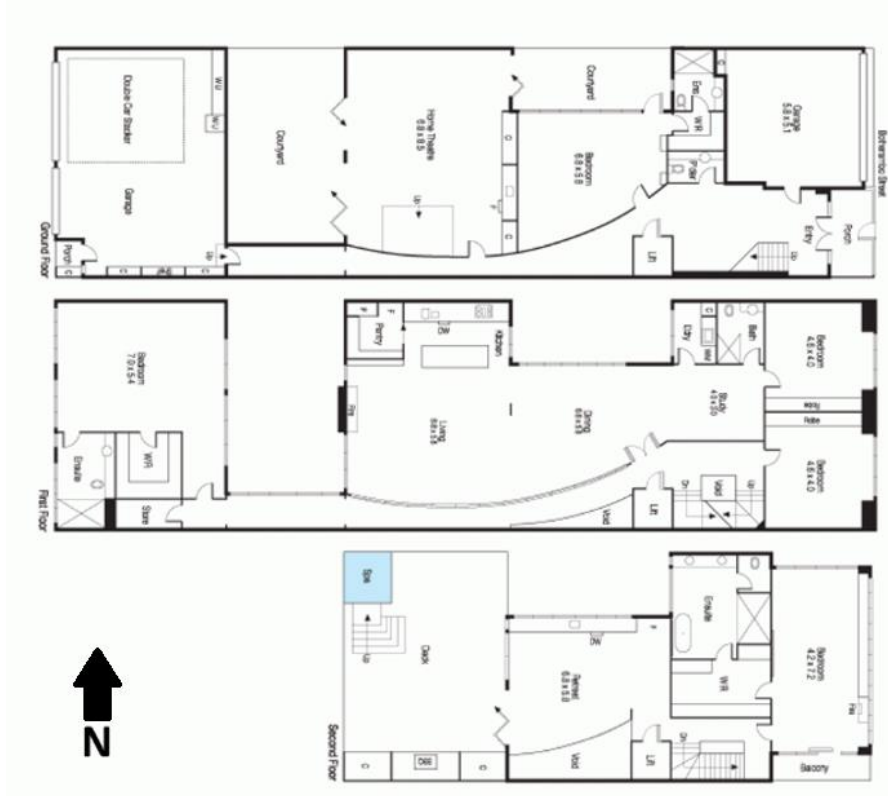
Floor plan of the adjoining dwelling at No. 23 Wangaratta Street
